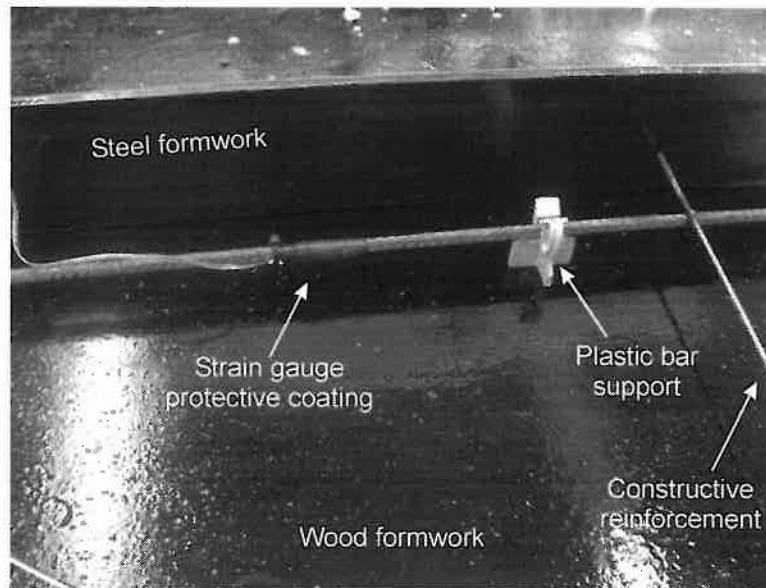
Detail of the strain gauge at the steel bar, bar plastic support and constructive reinforcement.
